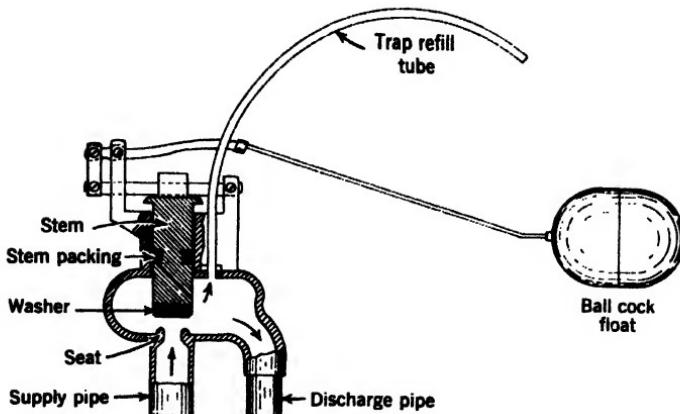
Cross section of a ball-cock valve for a toilet tank.
